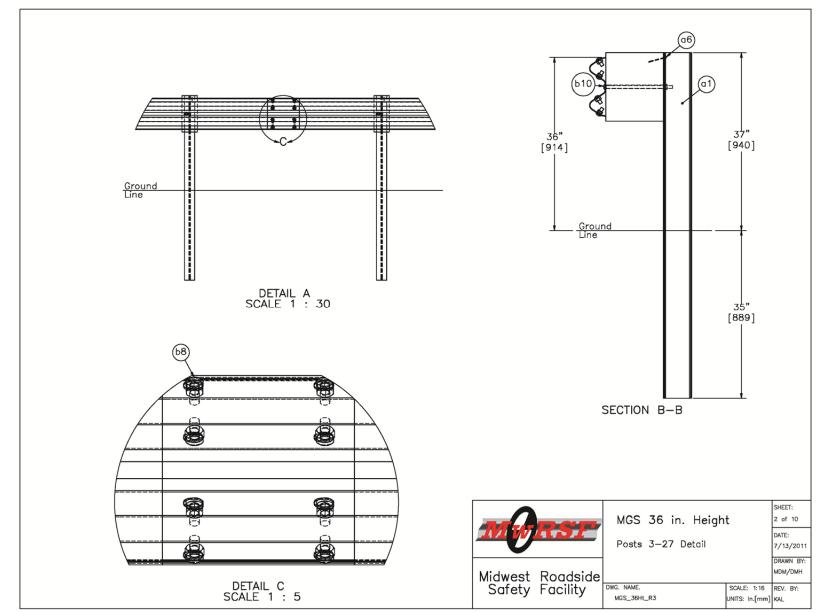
36-in. (914-mm) Tall MGS Details, Test No. MGSMRH-2
